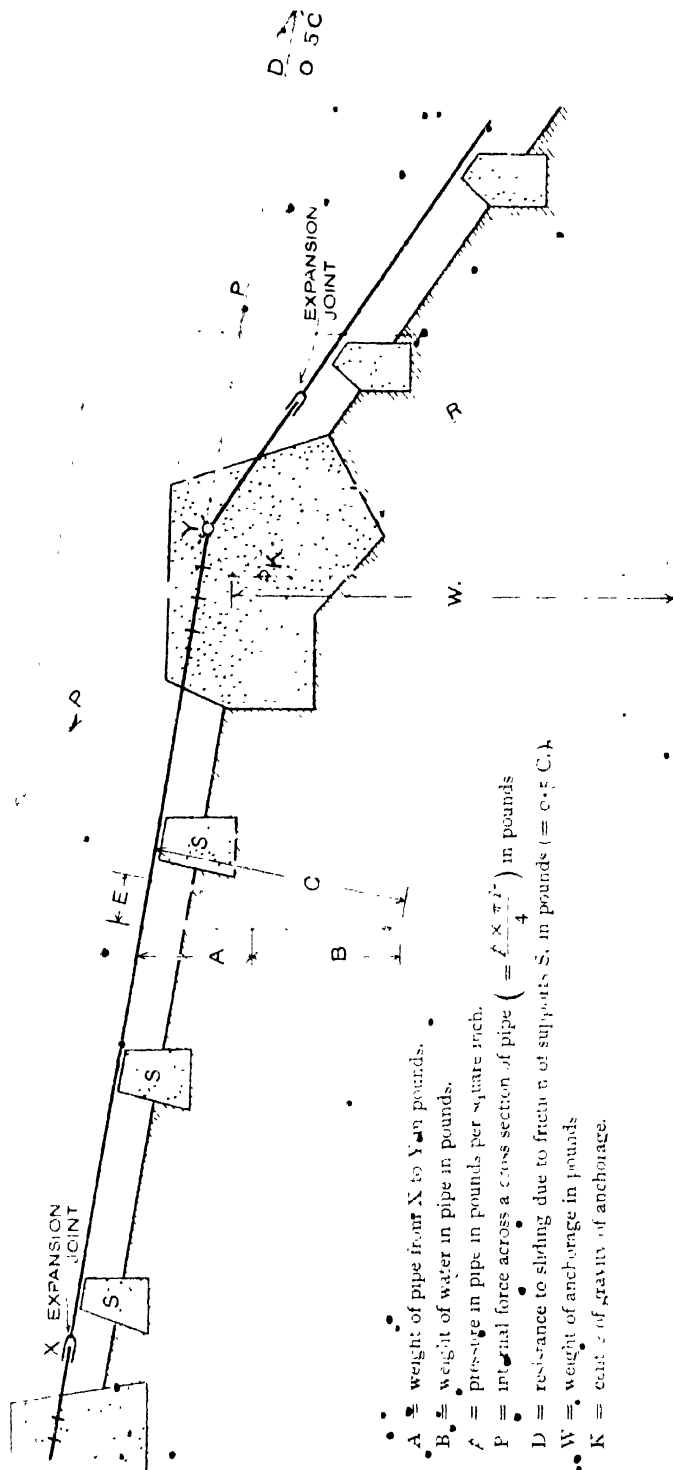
DIAGRAM OF FORCES ON PIPE ANCHORAGE
